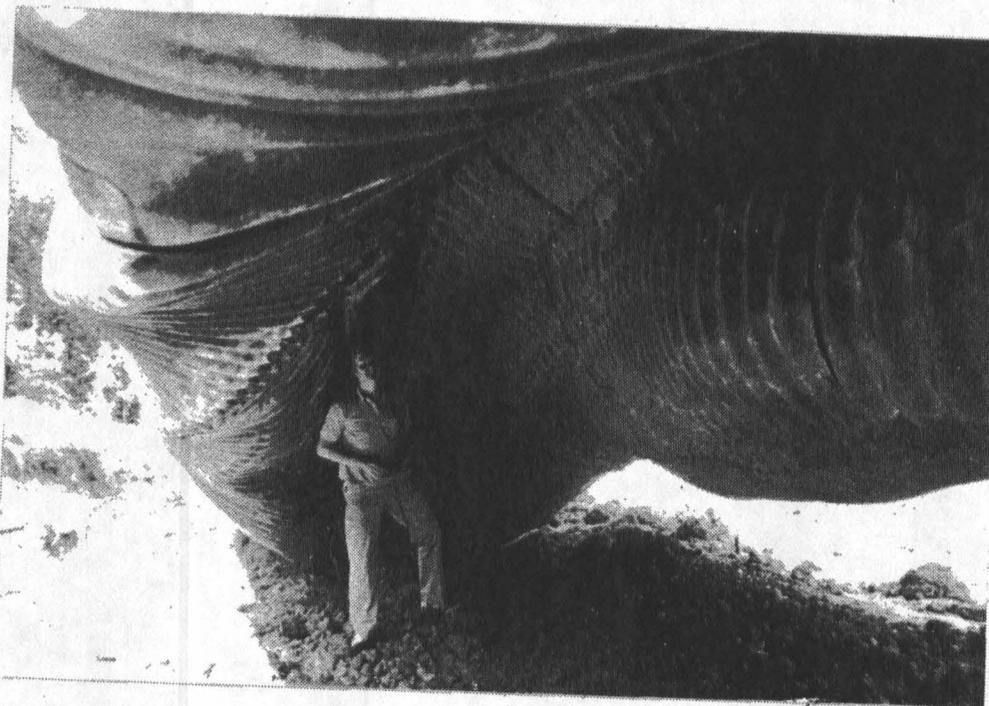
Photograph showing failure of pile tie down structure. This failure pulled the piles out of the ground as the inlet floated. The pipe was 120" diameter. The failure occurred in summer, 1989.
